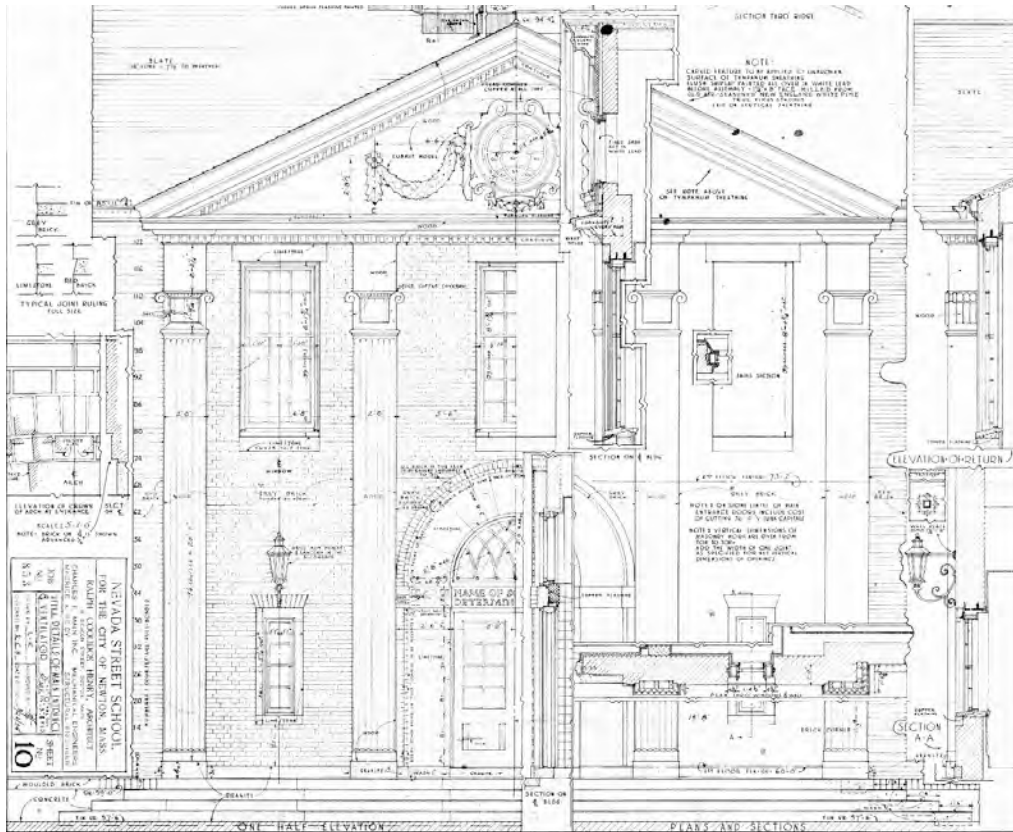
Excerpt from original 1934 construction drawings with a detail of the entrance pavilion. Note the wood carving at the pediment that was never constructed. The drawings specify that the pilasters should be constructed from wood. It is unclear why they were eventually made from cast stone (Credit: Newton Public Buildings Department).
